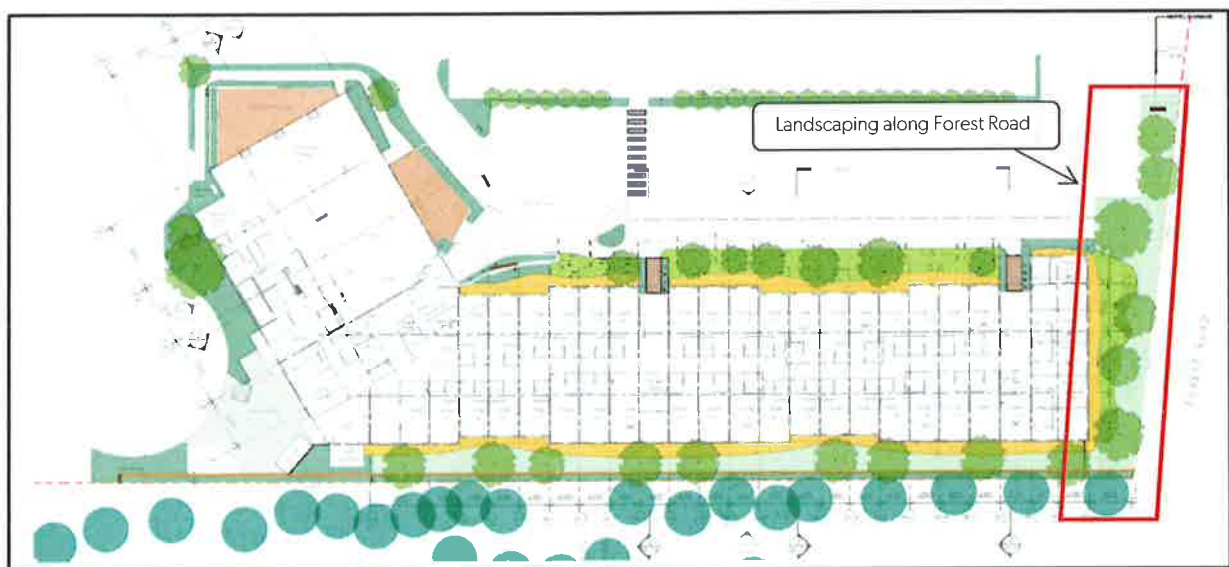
| Medi-Motel Landscape Concept Plan (Source: Application documents)
